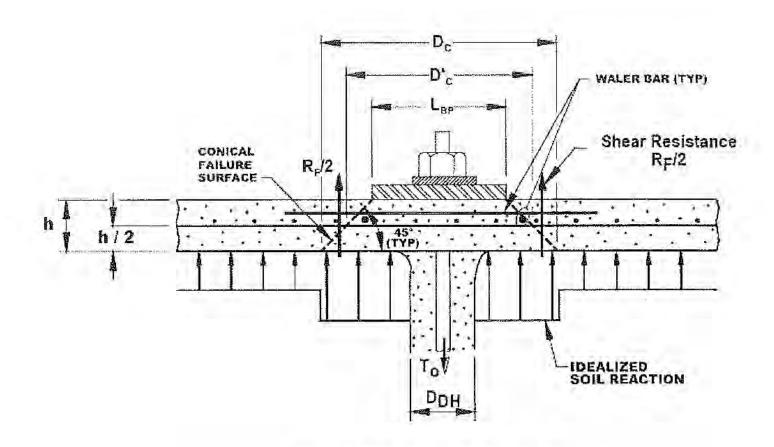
Shotcrete facing details (See Page 101 of FHWA Circular 7 for details)
